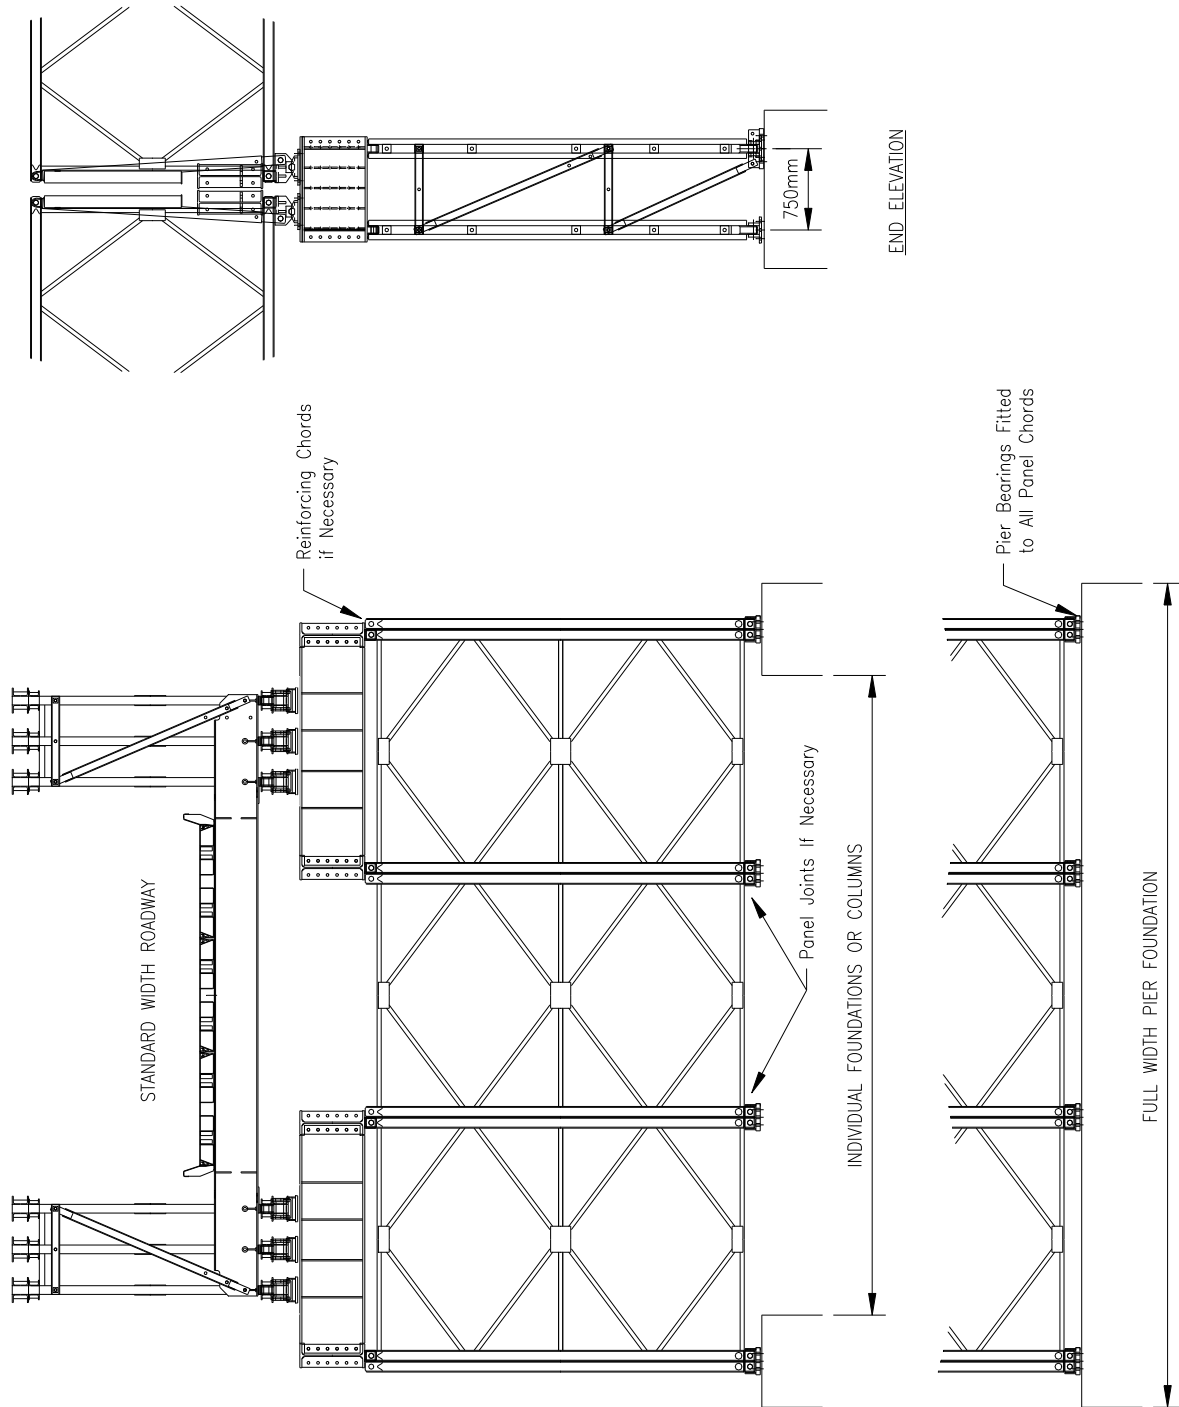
TYPICAL 3.5 m HIGH PIER LAYOUT
